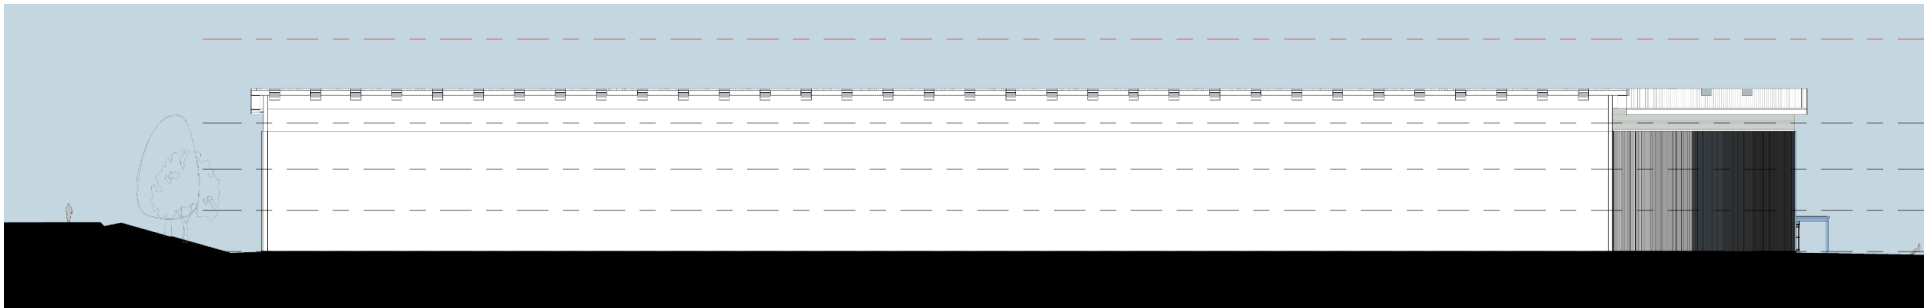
Section through proposed building and northern footway (Mill Lane Footpath) (north to south)
